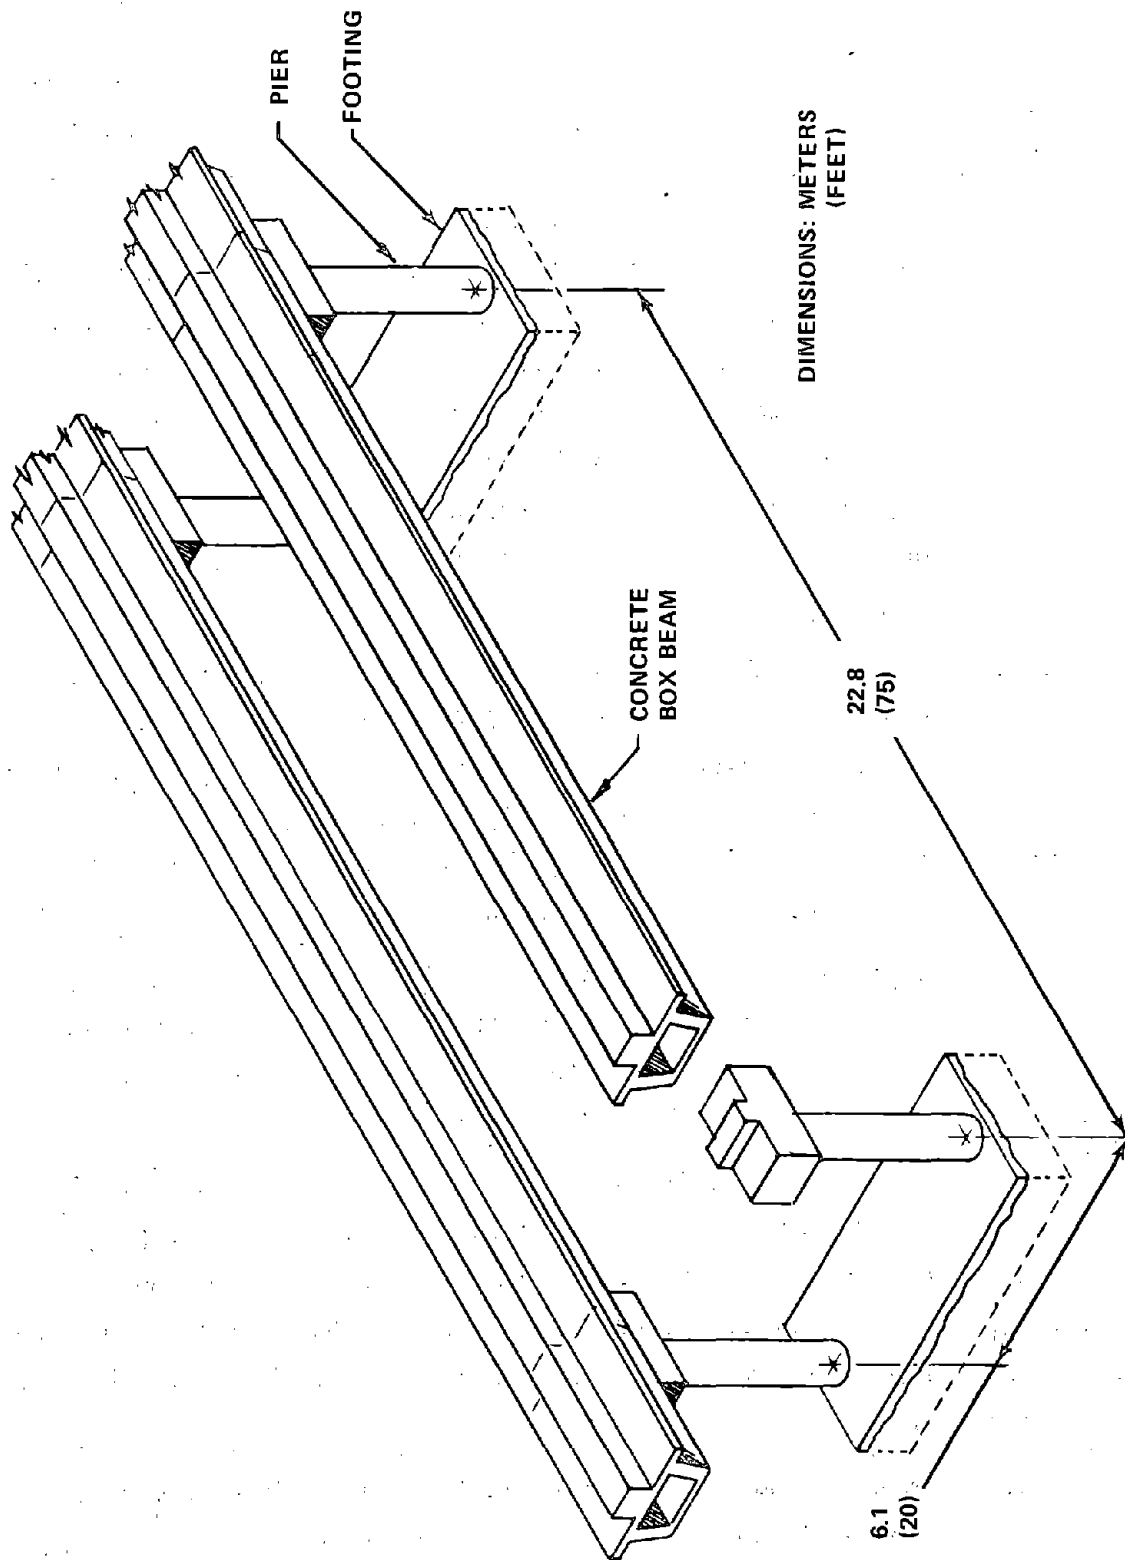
ELEVATED GUIDEWAY DESIGN
